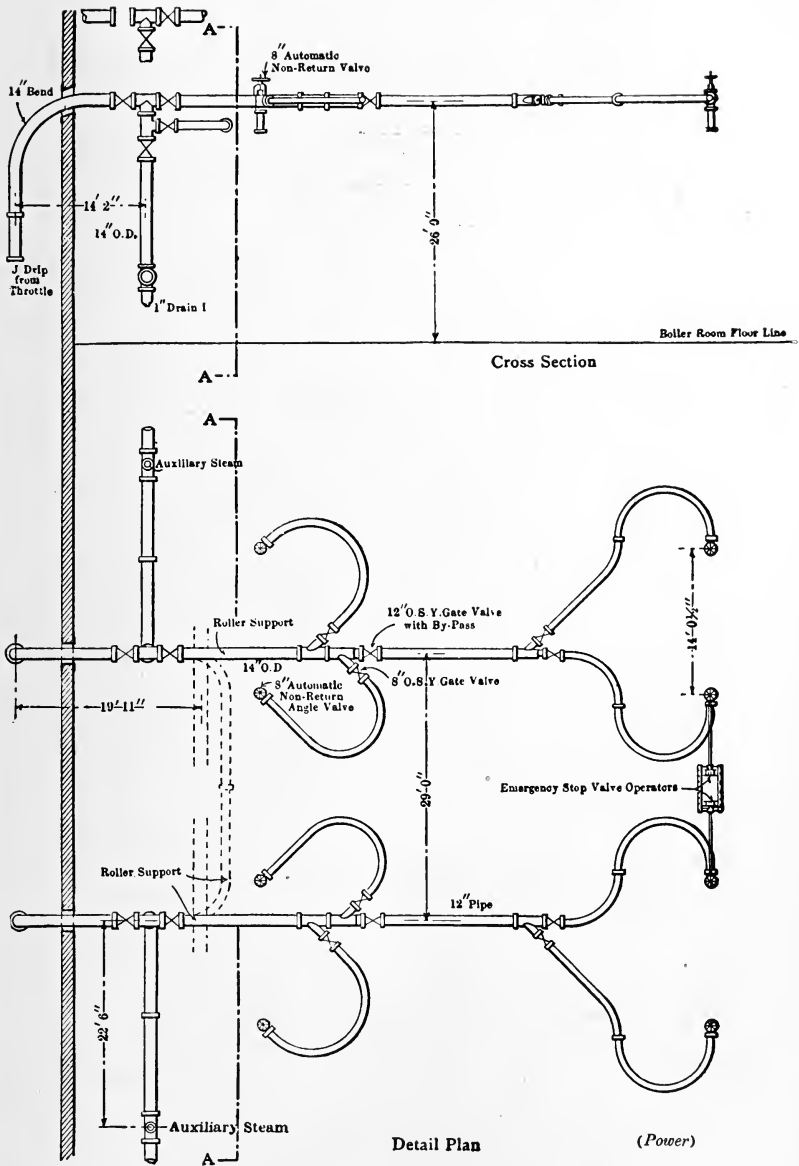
Details of Boiler Steam Piping, Yonkers Power House of the New York Central R.R.
